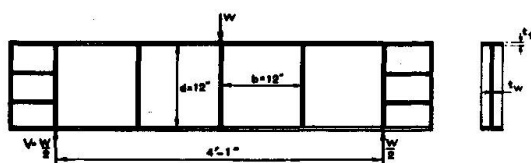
DETAILS OF SERIES II GIRDERS.
